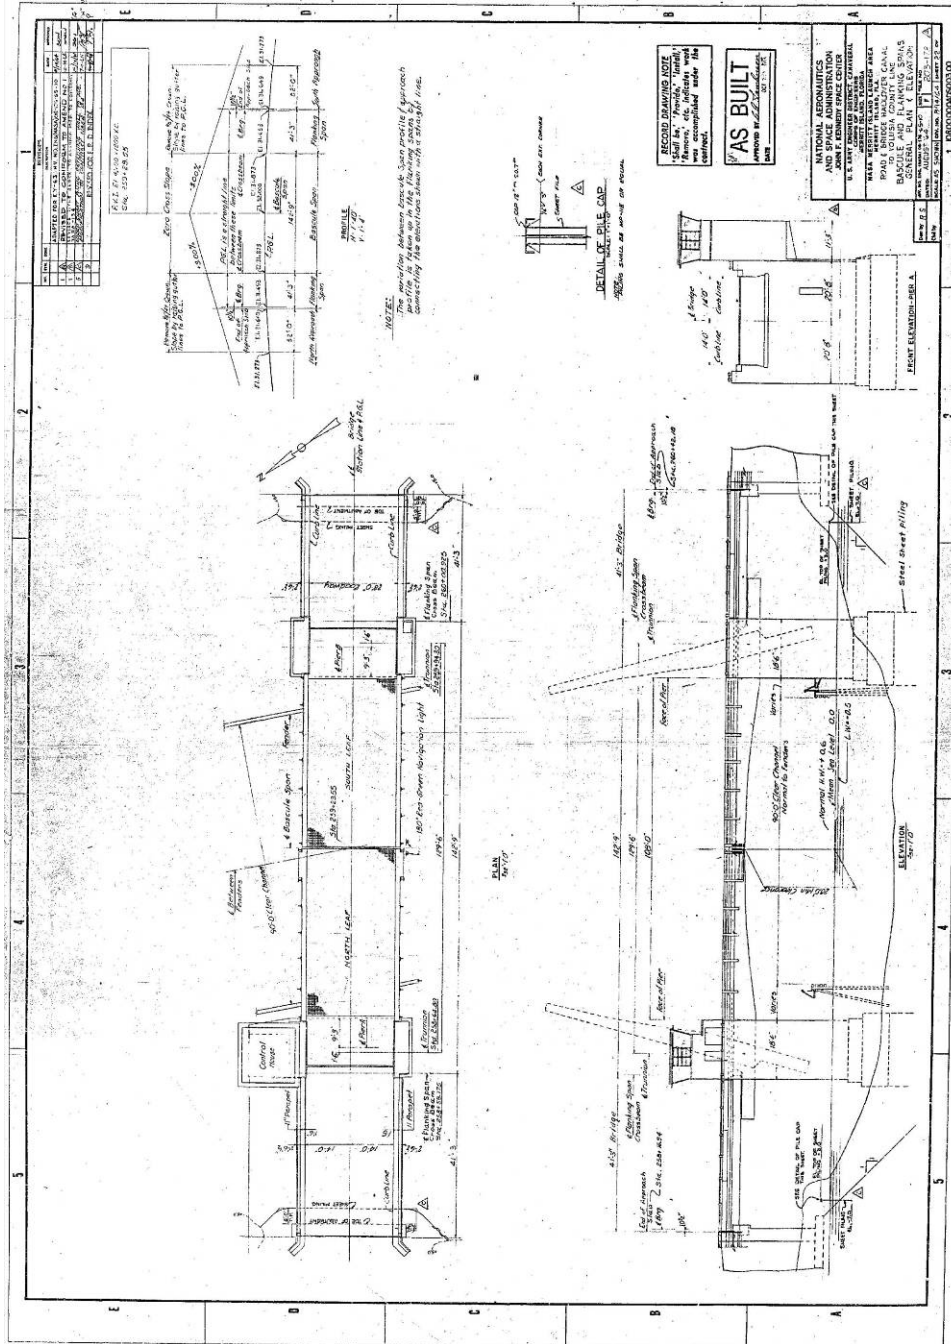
U.S. ACOE, "Plans of Proposed Road and Bridge Haulover Canal (to Volusia County Line)," Bascule and Flanking Spans, General Plan & Elevation, August 1964, Sheet 22.
